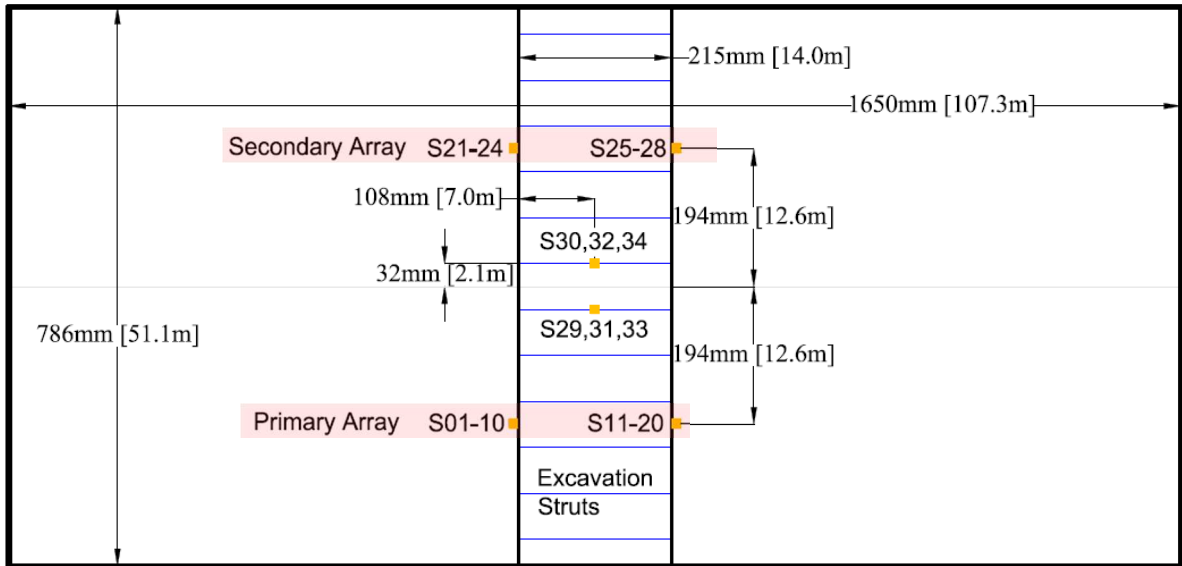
E-No Bldg plan view of strain gauges mounted on the excavation walls and struts.
